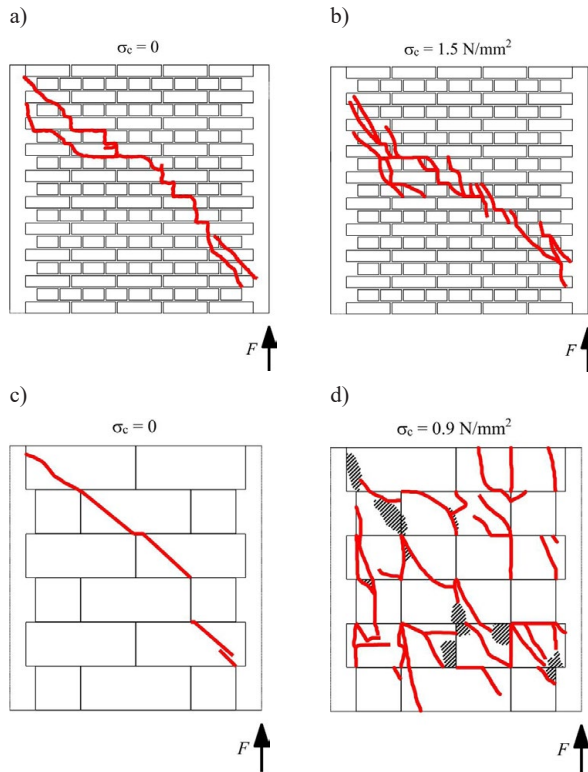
Cracks pattern at the failure of masonry specimens made of: a), b) ceramic bricks, c), d) AAC blocks.
